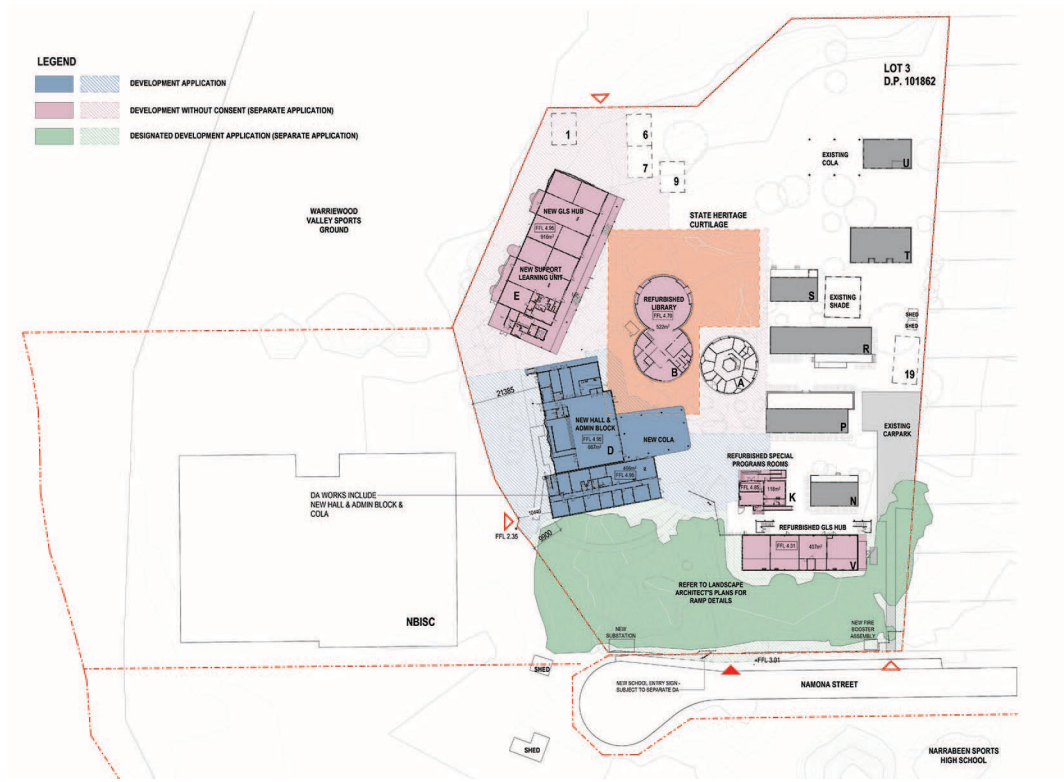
Proposed NNPS site plan showing the location of the various planning pathways
